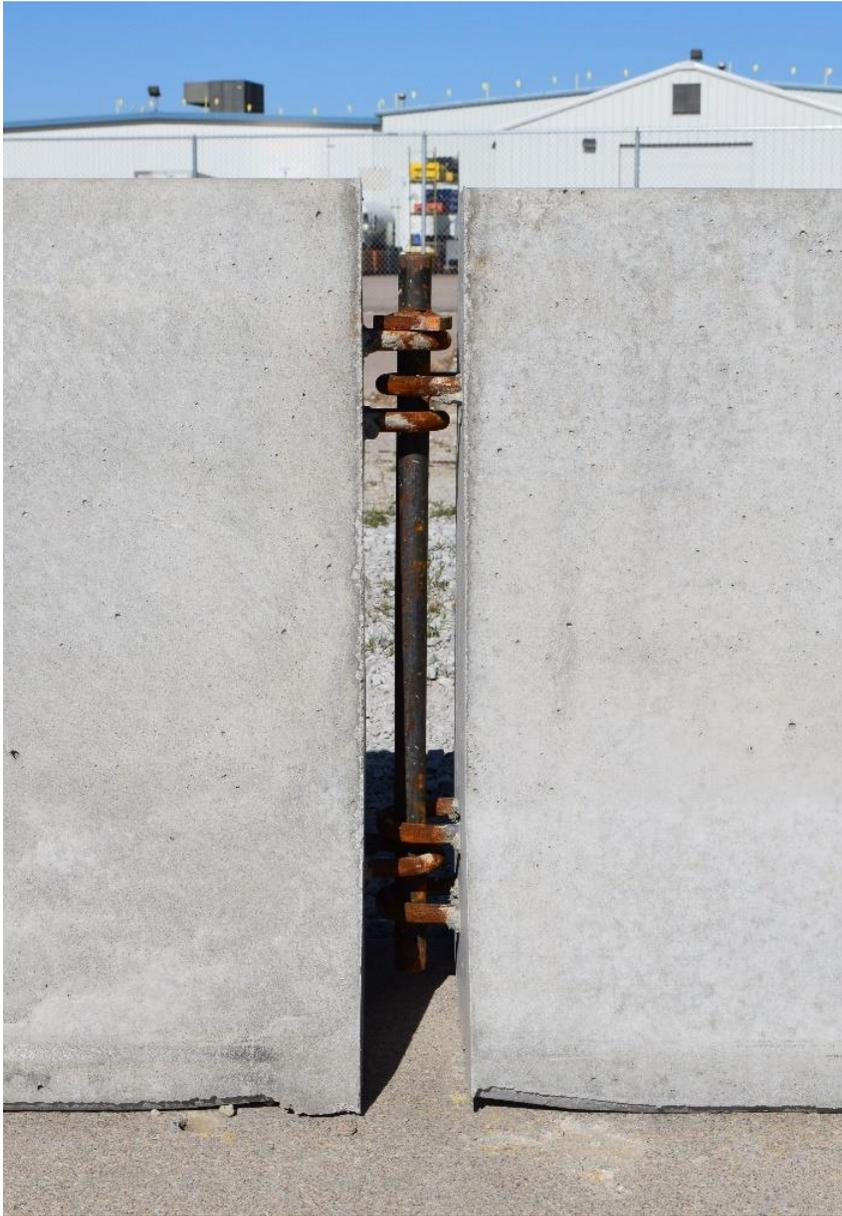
Connection and Anchor Pin Details, Test No. WITD-1
